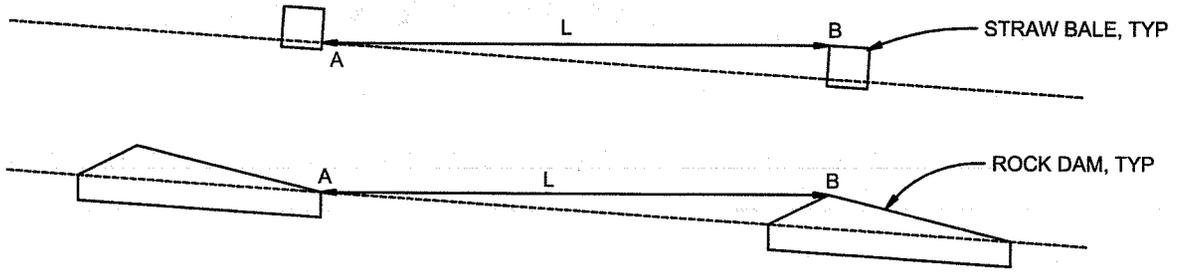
provides a construction detail and maintenance requirements for a check dam.
